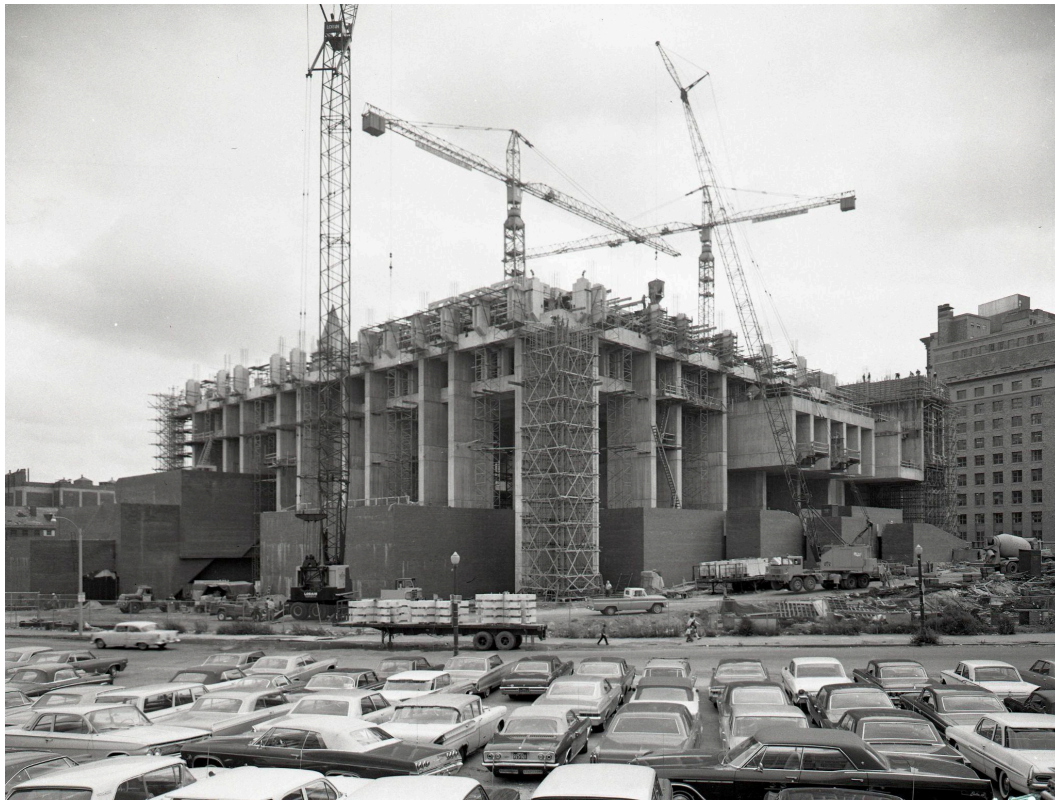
Boston City Hall under construction; looking southeast from JFK Building. (1966)
